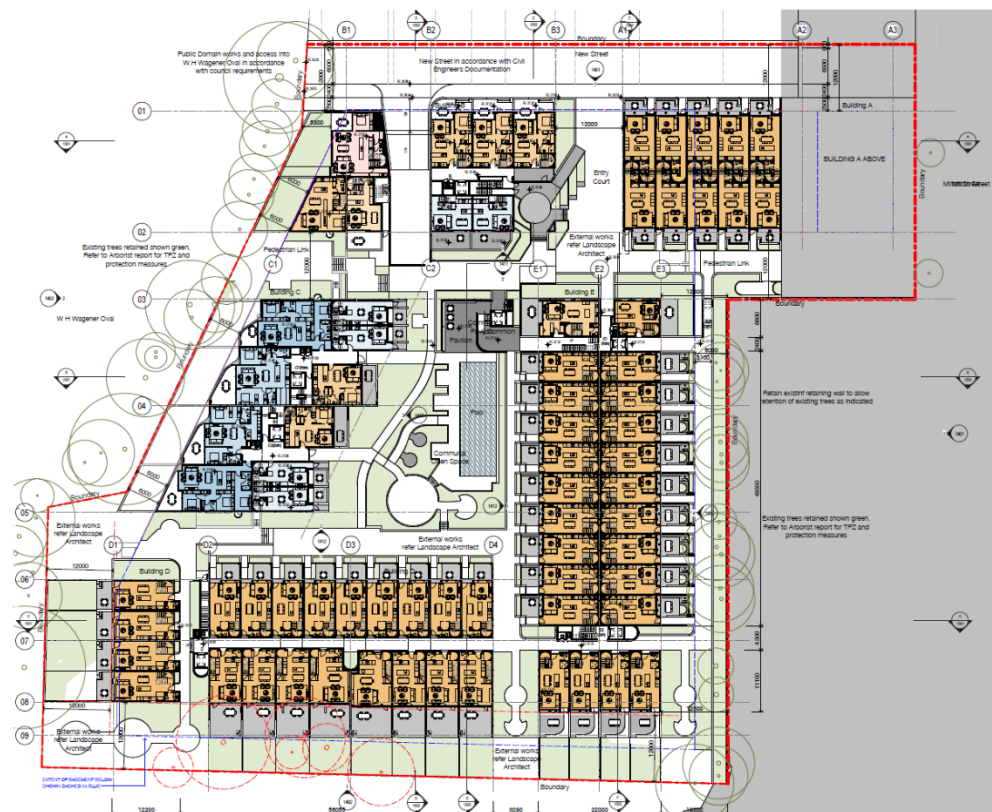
Proposed Overall Ground Level Plan. (Source: SJB Architects)
